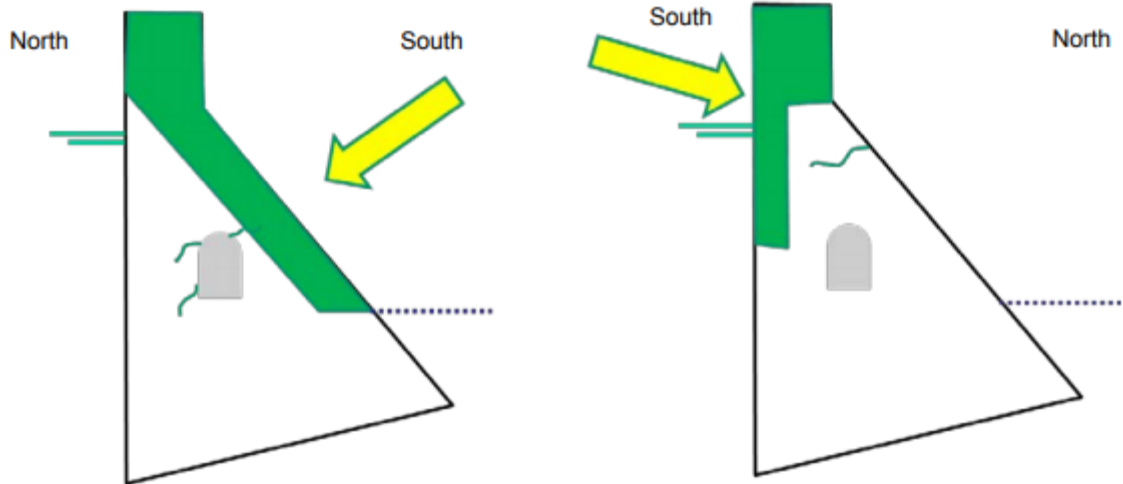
Sun-facing concrete areas in gravity-arch dams differently facing the sun [3.4]
